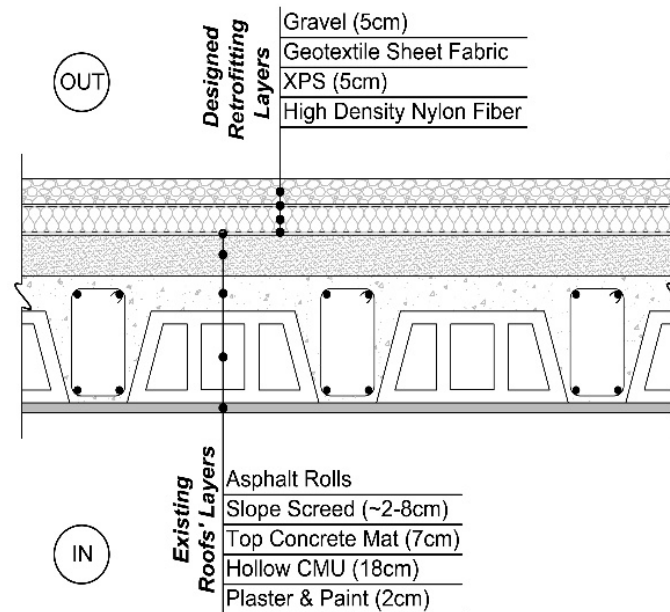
Typical cross-section through the school's two-way ribbed roof showing existing and added retrofitting layers (N.T.C.). Drawn by the 1<sup>st</sup> author using AutoCAD 2022
